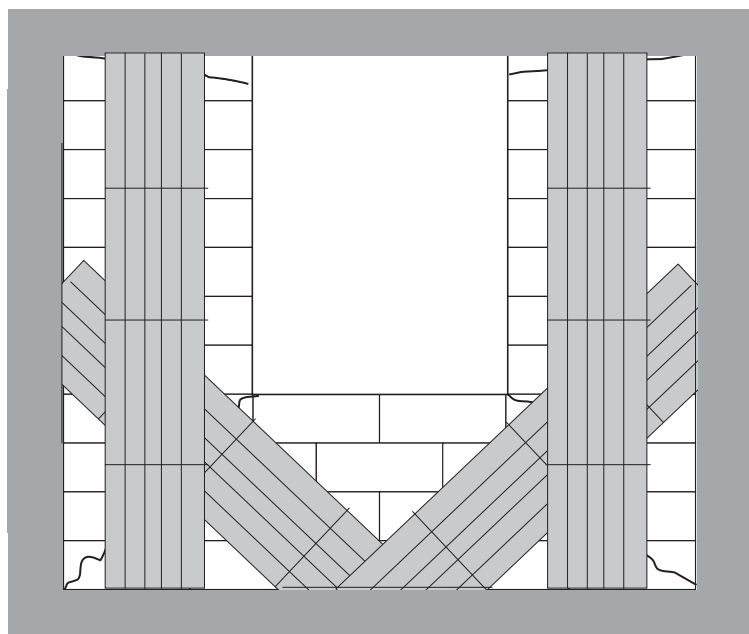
Detail on the layout of reinforcing glass fibre on a masonry infill wall with window
